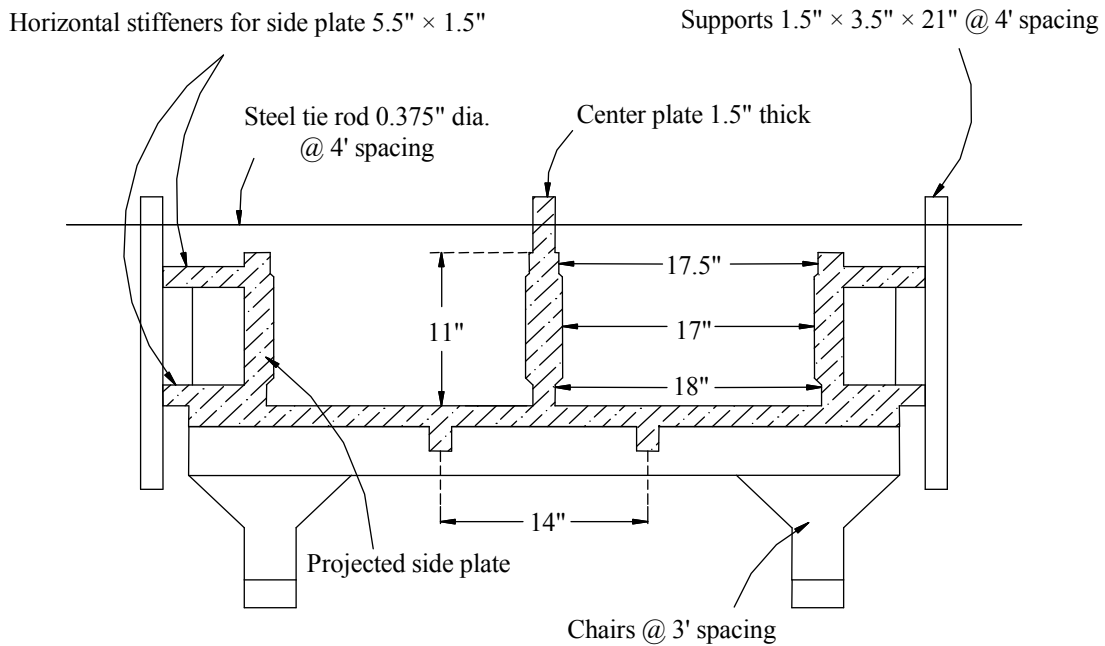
Cross-section of the formwork for the interior box-beams.
